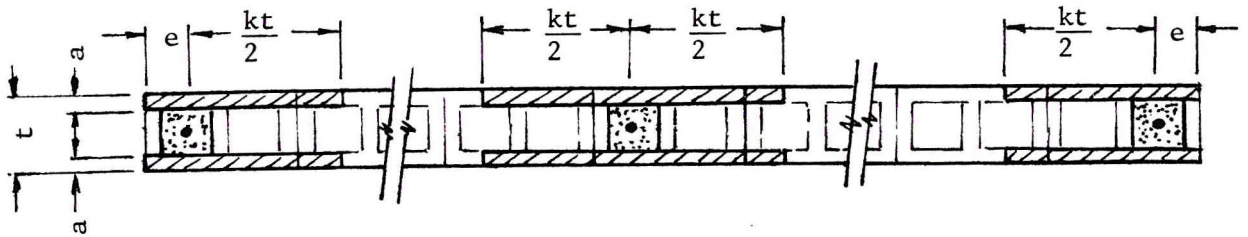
EFFECTIVE WIDTH OF BEAMS
